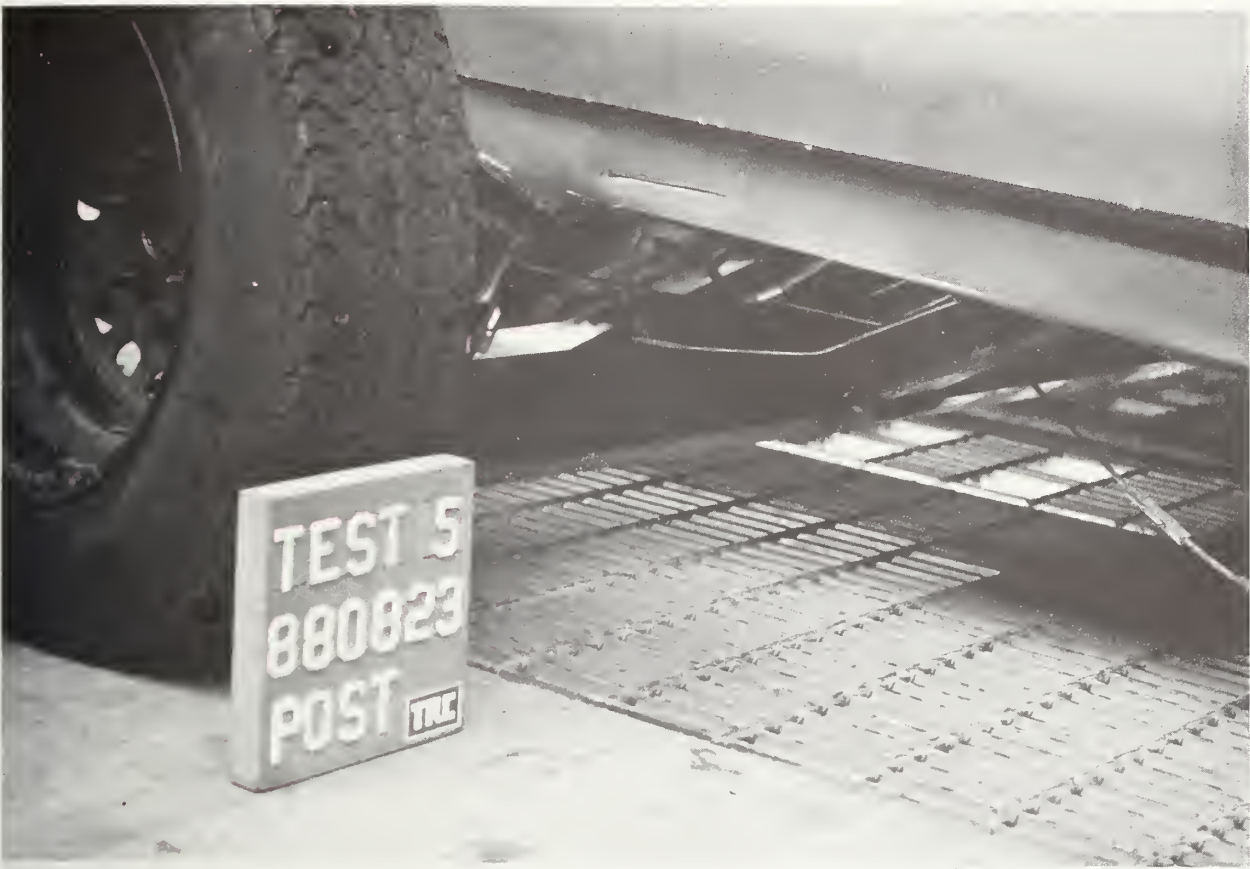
POST-TEST CLOSEUP - VIEW 8
